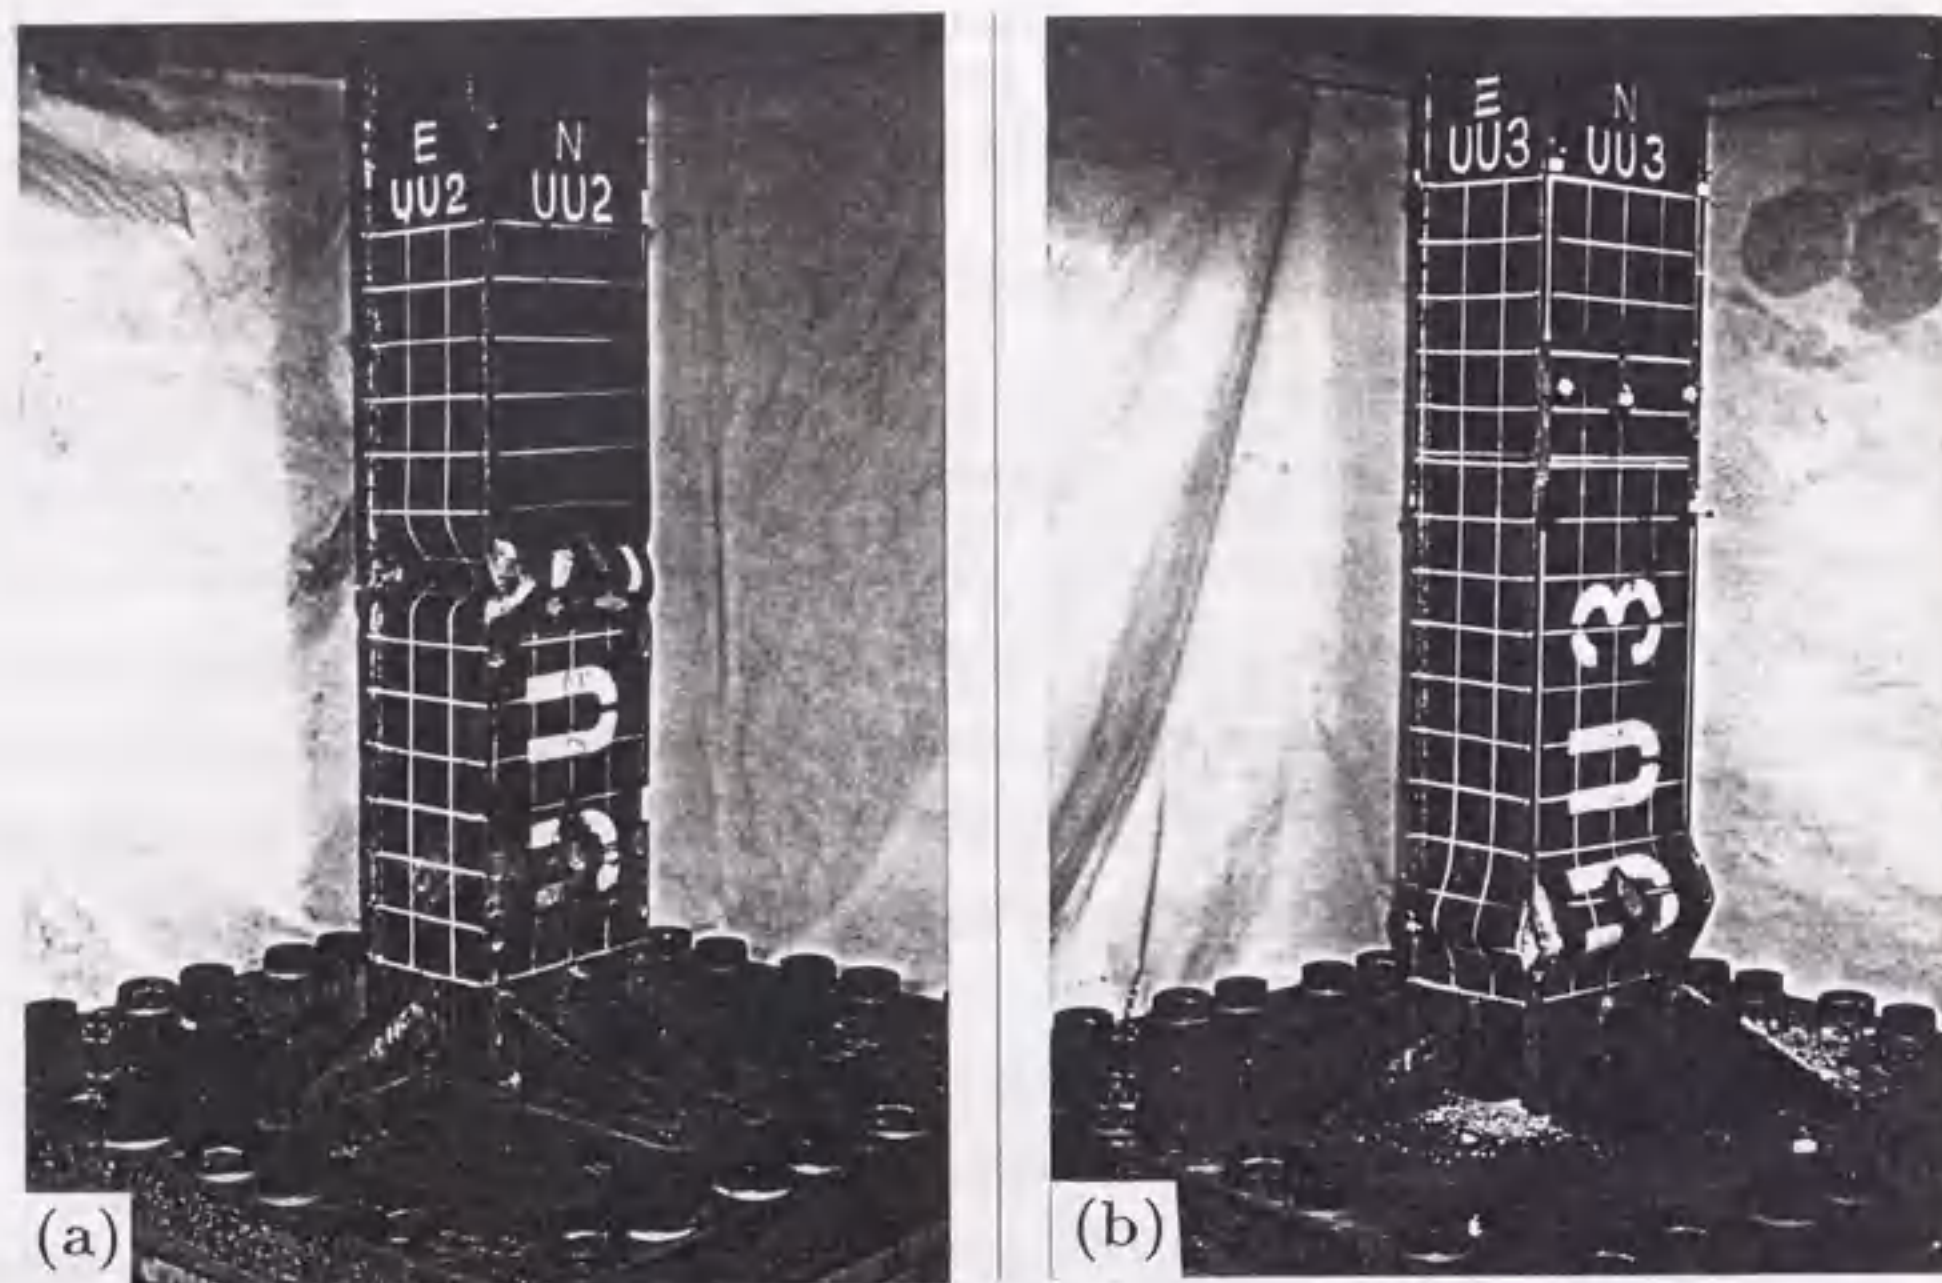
Concrete-Filled Test Specimens after Failure: (a) UU2; (b) UU3
